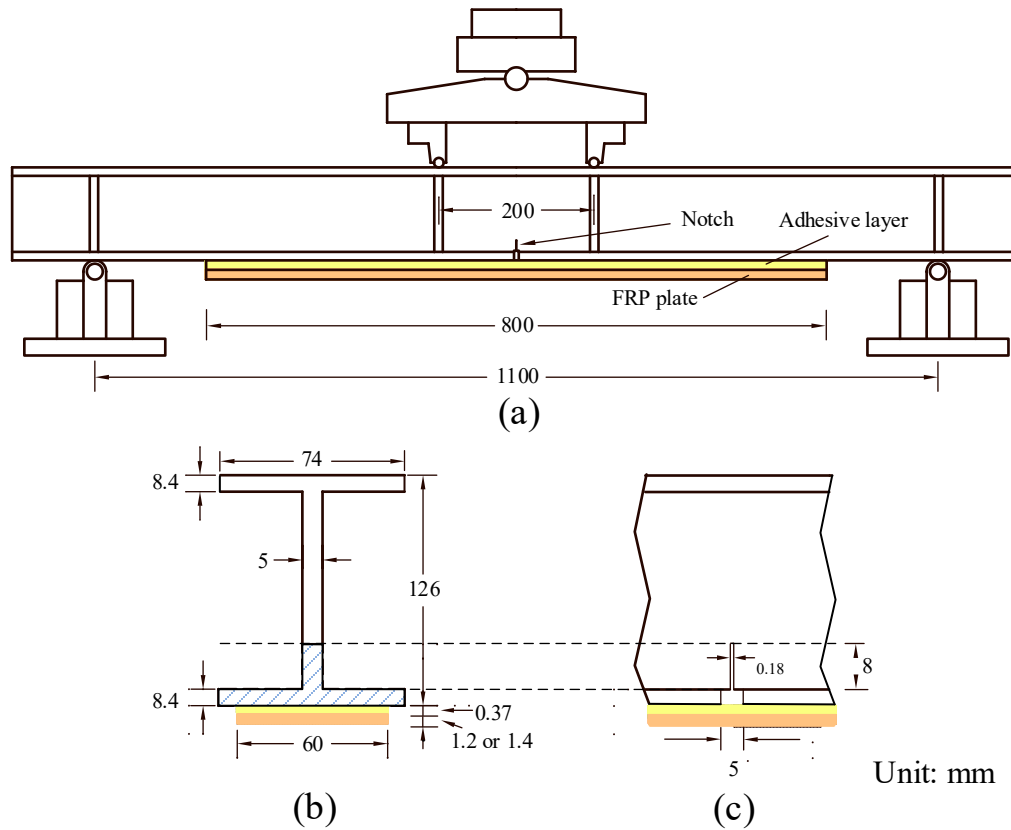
Schematic of the CFRP-retrofitted steel beam: a) front view; b) side view; c) close view of the precast notch.
